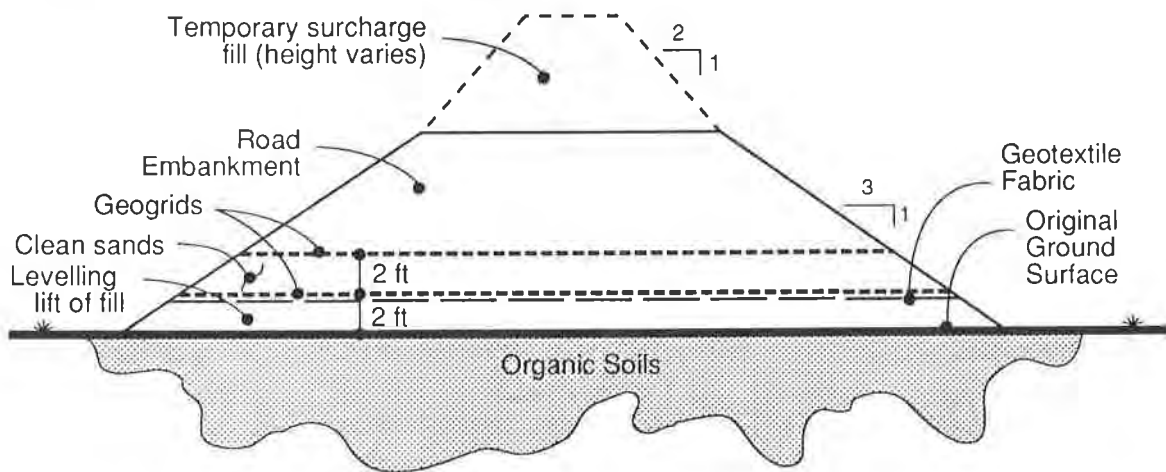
Typical cross-section for 2-layer reinforcement embankment system
